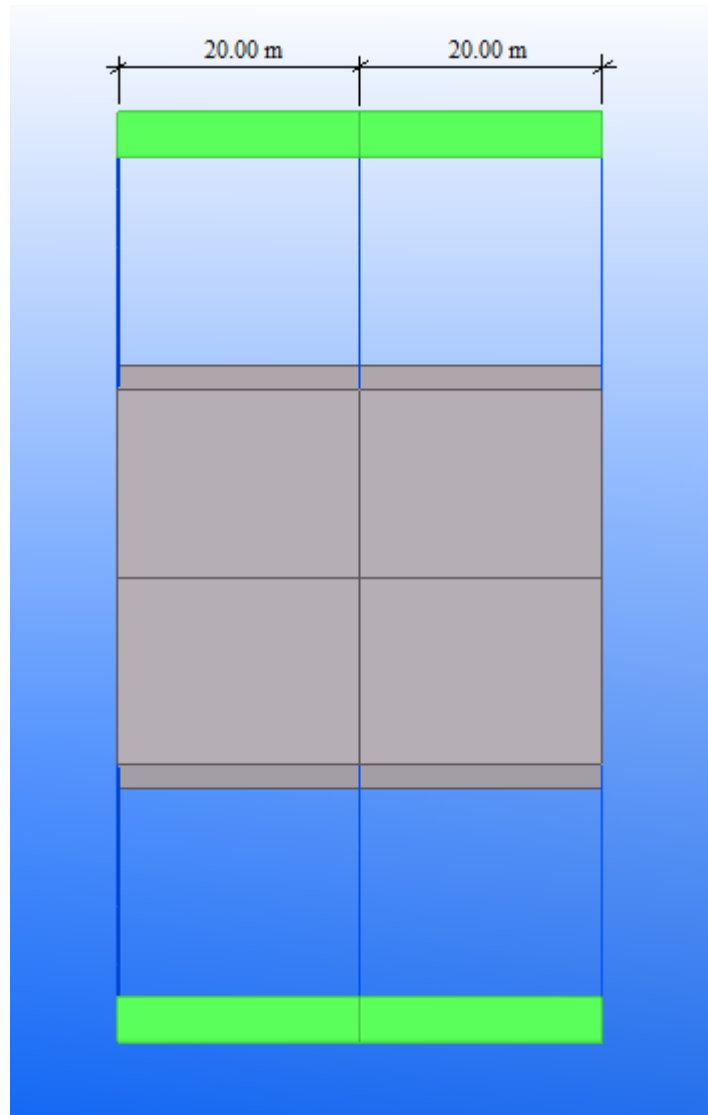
Plan view of wing, support and deck configuration for 2 deck section.
